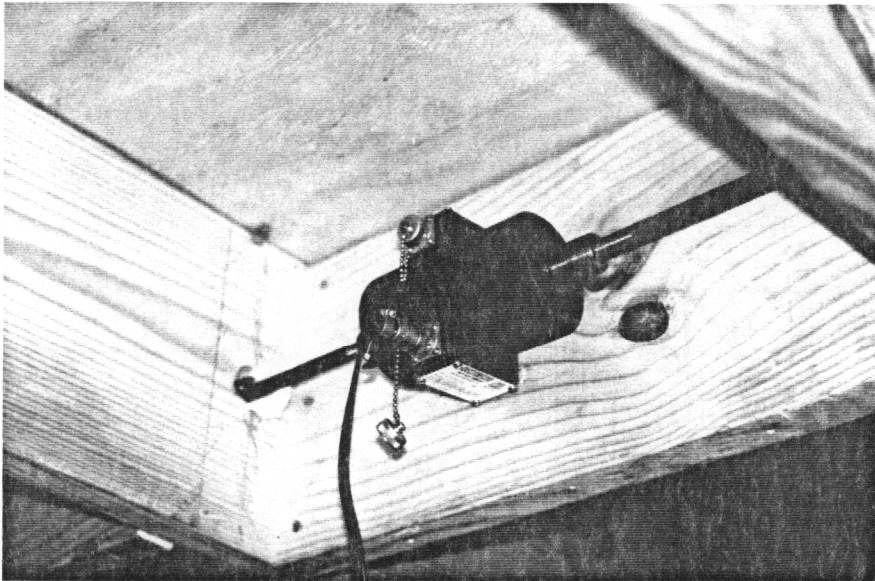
Post-Tension Rod and Load Cell Under Floor
